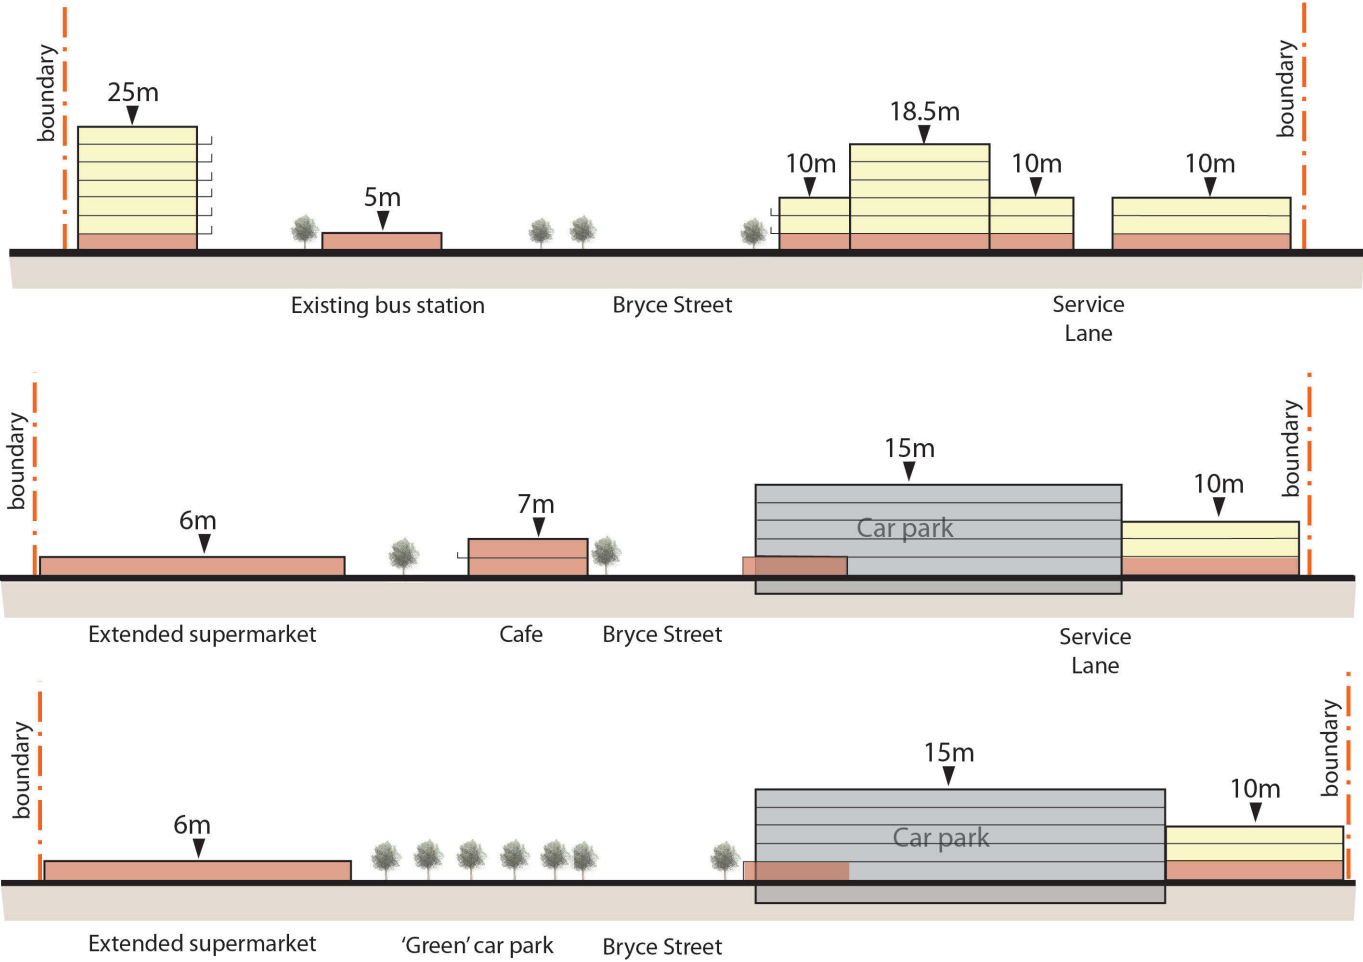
Indicative concept sections A-A, B-B and C-C for Development Site 4 - (not to scale)
